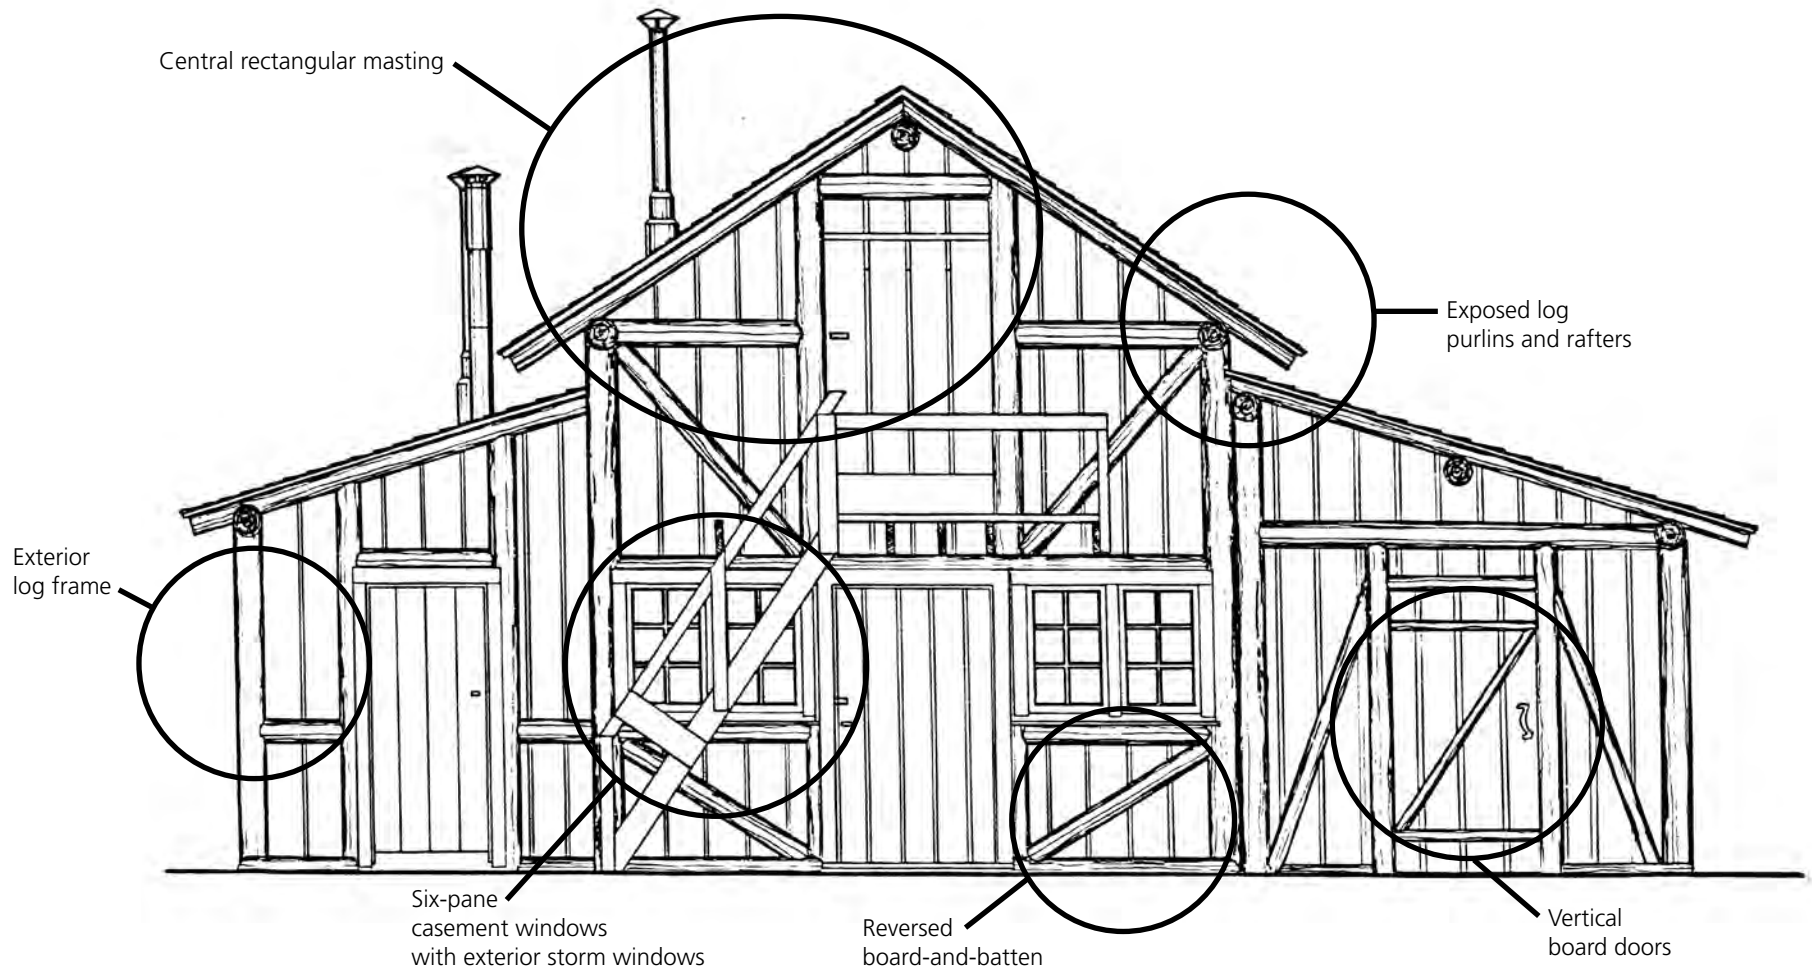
Building 105, North Elevation, Historic American Building Survey, National Park Service, W. Vandeventer and Dave Snow, 1950 (NPS Alaska Regional Office Files)
